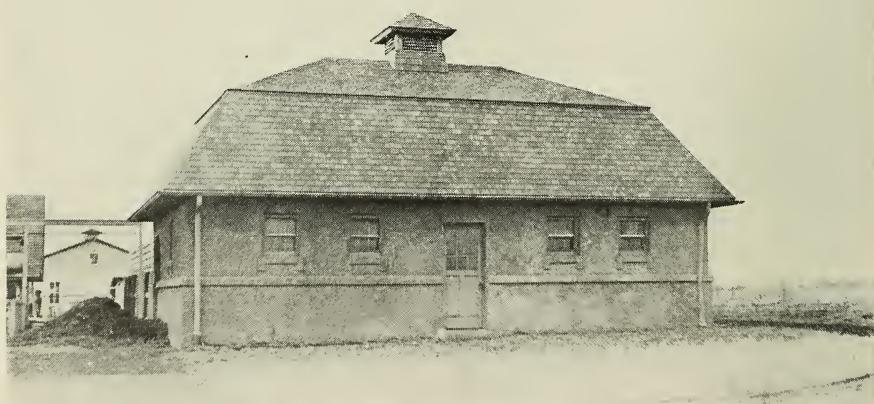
Stallion Barn on Col. G. Watson French's Iowana Farm near Davenport, Iowa. A structure with pleasing lines and convenient interior arrangement.
